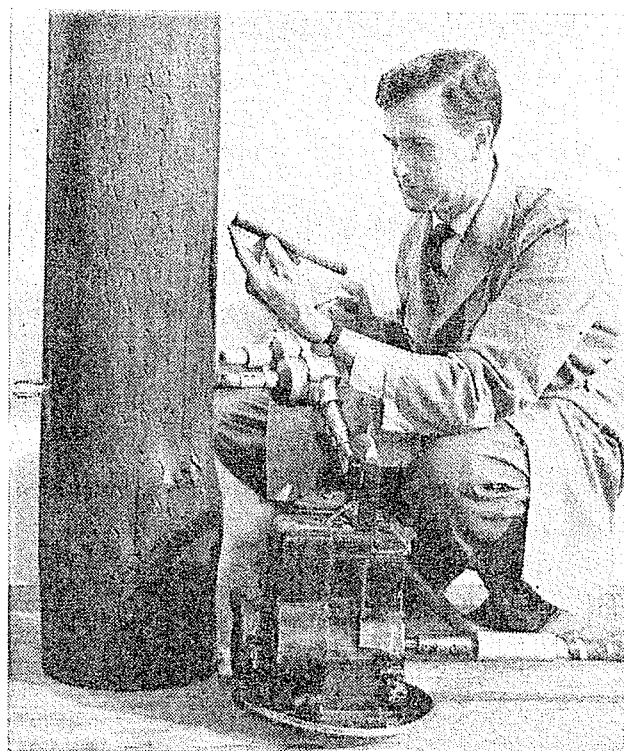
Close-up of extended plug cutter with freshly removed plug.
